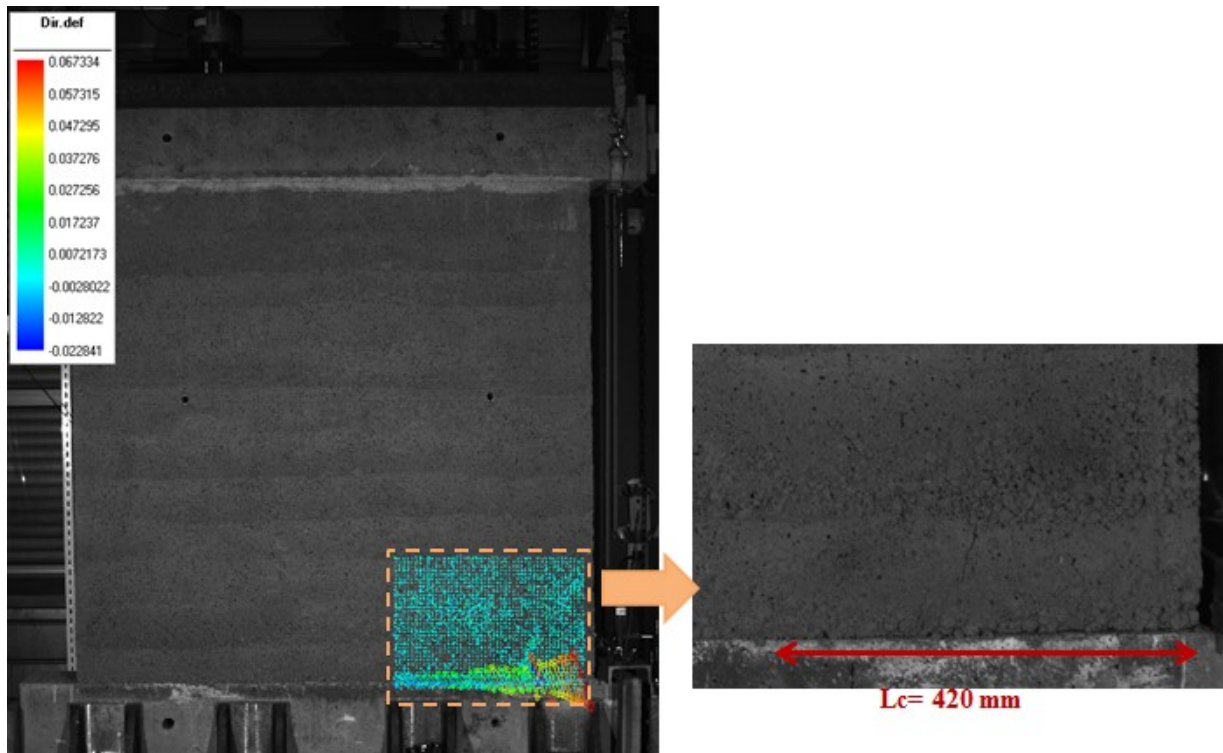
Rocking at the base of wall 2 (corresponding to 32 kN horizontal loading)
